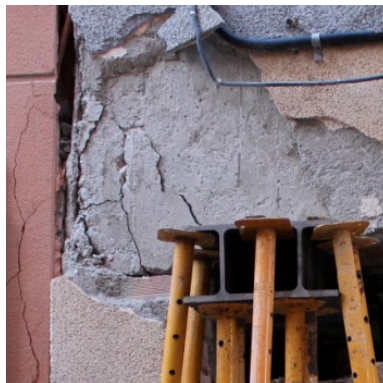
Brittle shear failures of RC beam-column joint
